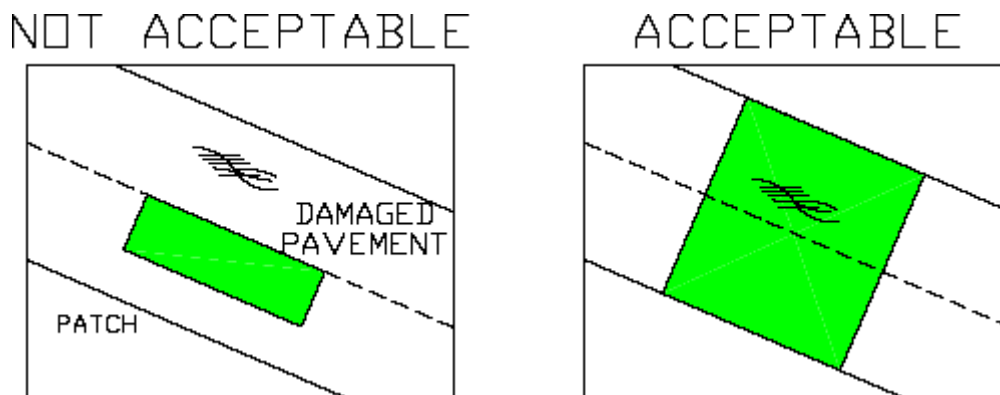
Example 12: Damaged pavement within 10 feet of a patch must also be patched.
